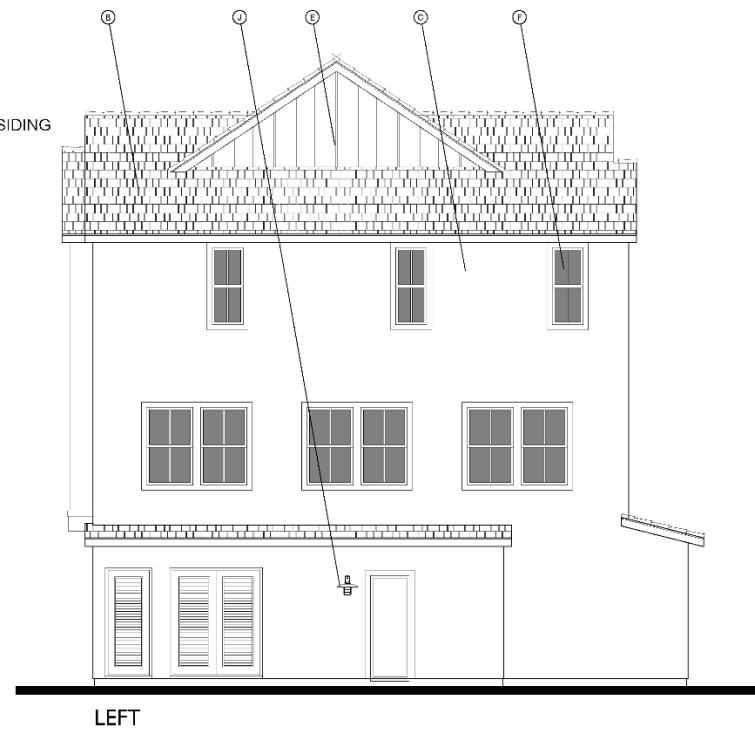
Farmhouse Elevation - Townhome (6-Plex) – Side
